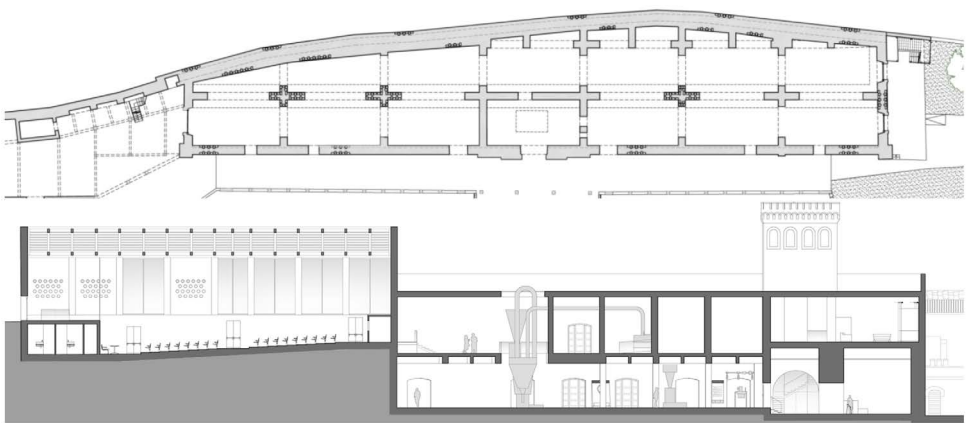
Plan and section of the Mill-Garden at Zolfara, Tufo (Italy)
